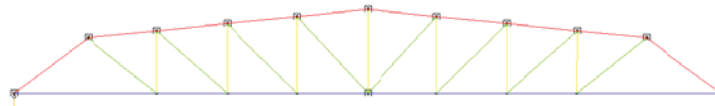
Fixed points for out of plane flexural buckling of truss members
